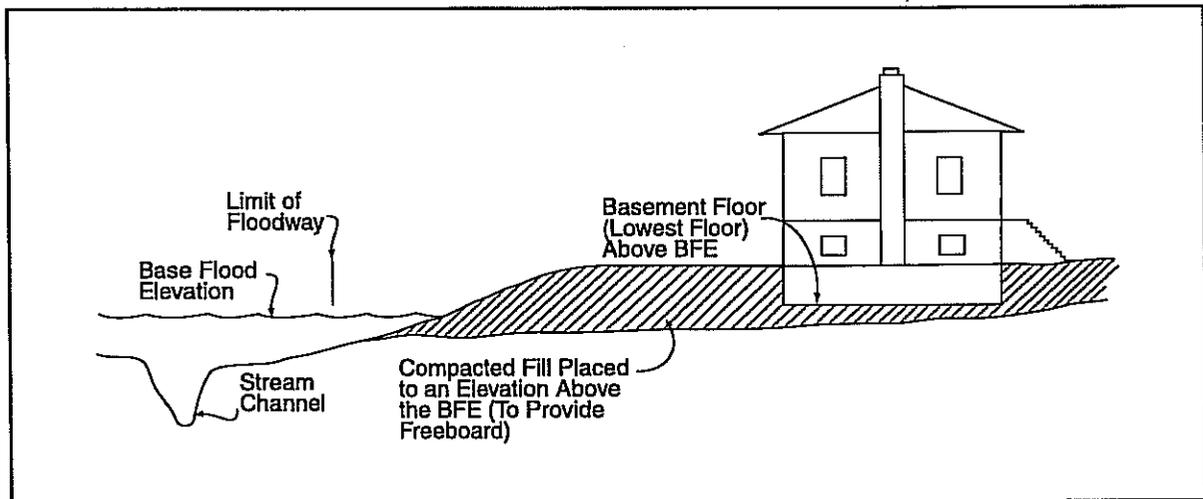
Basement foundation with lowest floor above the BFE. Damage from floods below the BFE is eliminated.
